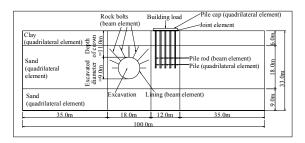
Tunnel excavation geometry for NATM with pile foundation at one side of tunnel.
